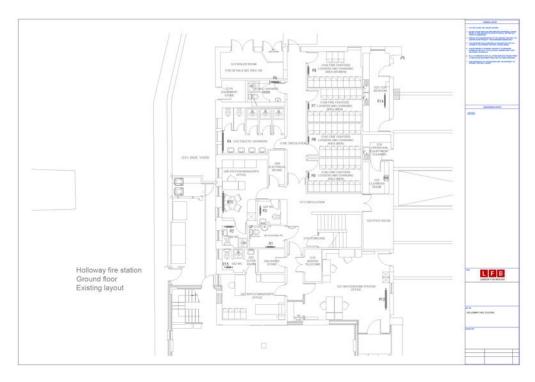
Holloway fire station, existing layout on ground floor (phase 1 of project)
